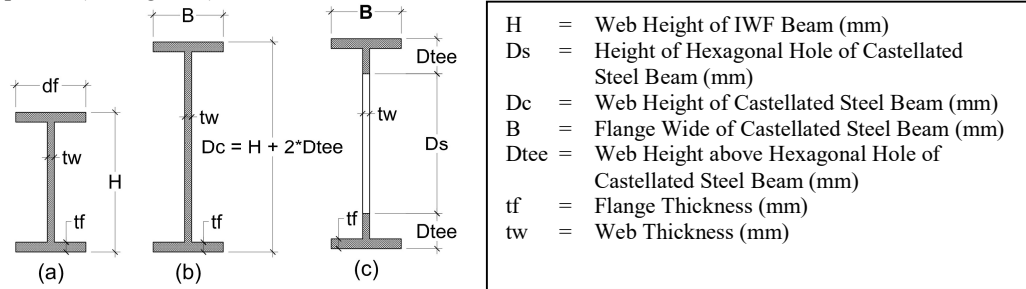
(a) Cross Section of Original IWF Beam; (b) Cross Section of Castellated Steel Beam at Whole Section; (c) Cross Section of Castellated Steel Beam at Hole Section
